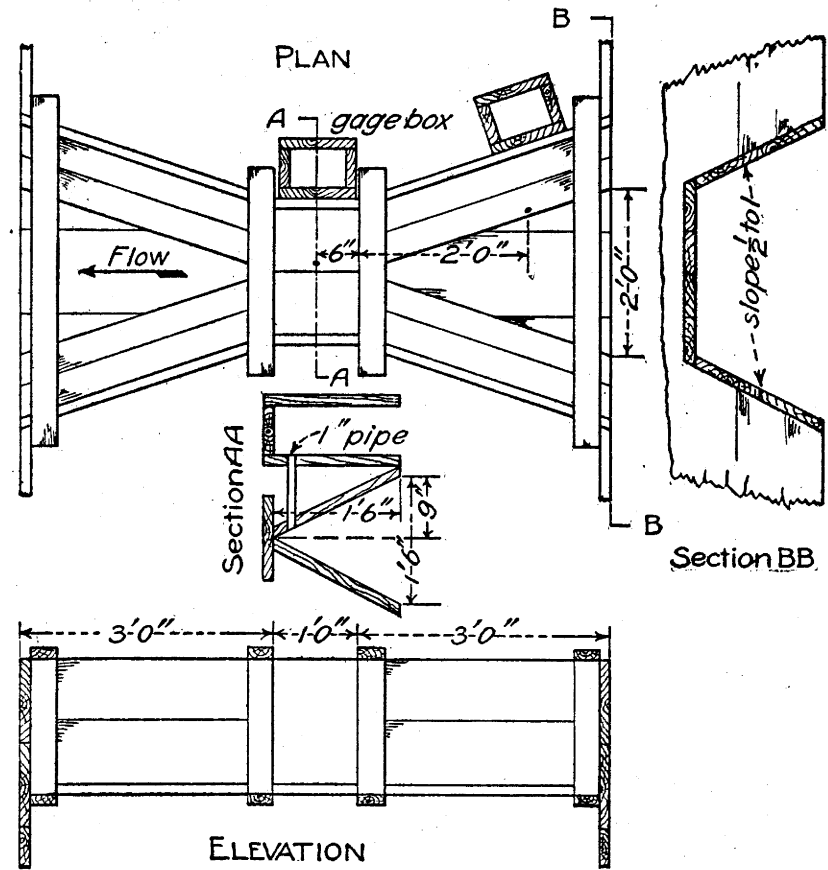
Plan, elevation, and sections of the V-notch Venturi flume.
